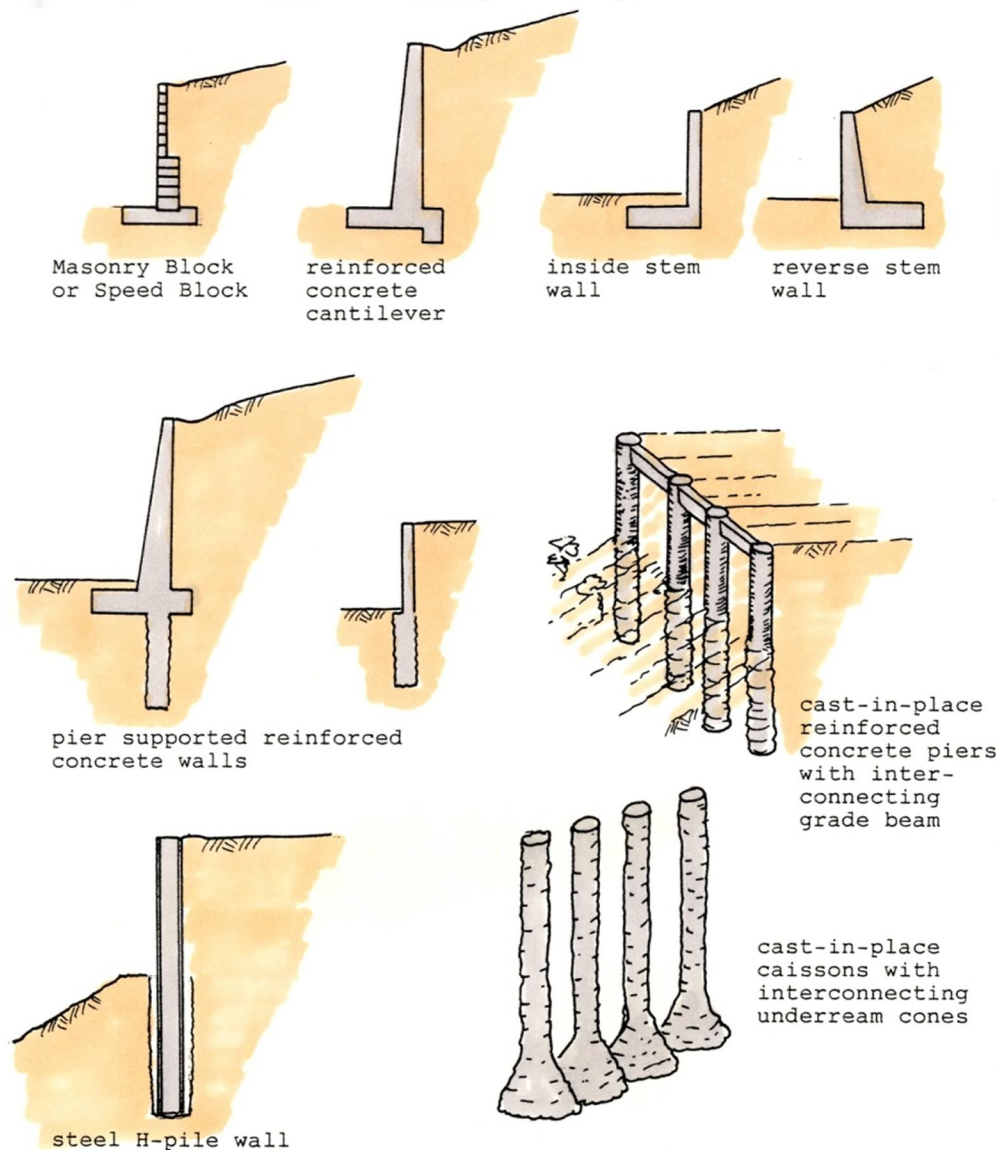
Various types of cantilever retention structures. Such structures came into use with the advent of pile driving, which dates back to Roman times. The use of large-diameter augers allows such structures to be constructed in stiff soils and soft rock.
